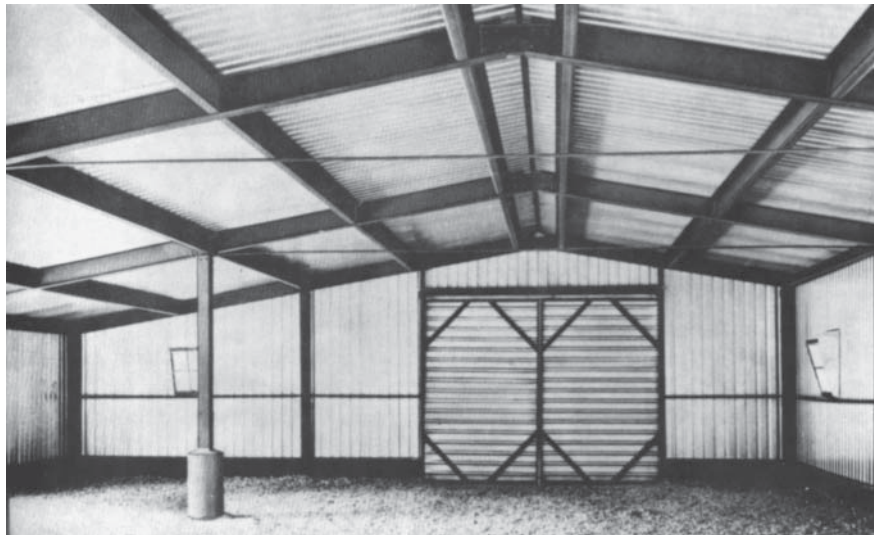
Small building made entirely of cold-formed sections. Courtesy of Stran-Steel Corporation.^{1.6}
